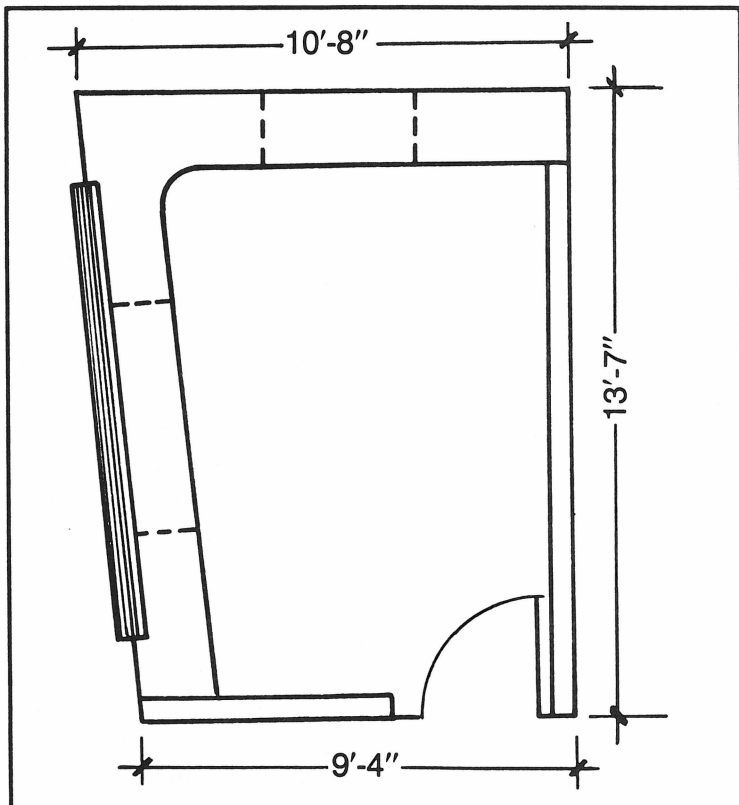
Floor plan of control room. Built-in work surface extends the length of two walls.
